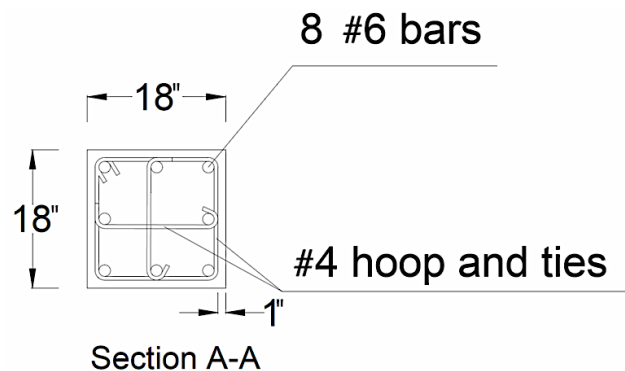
CROSS-SECTIONAL LAYOUT OF THE REINFORCEMENT IN TESTED SPECIMENS
